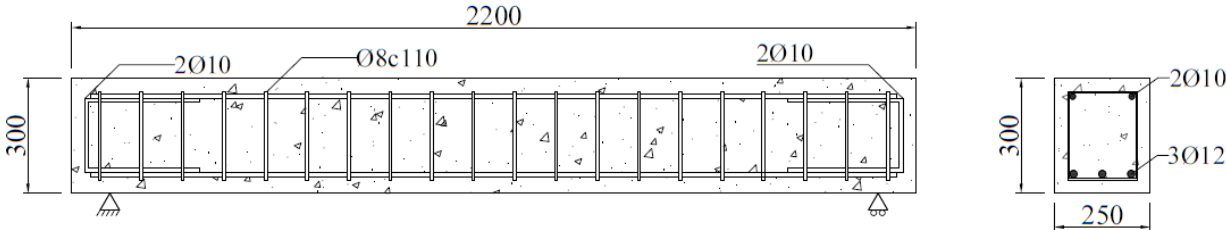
Dimension and reinforcement details of beam (All dimensions are given in millimeters)
